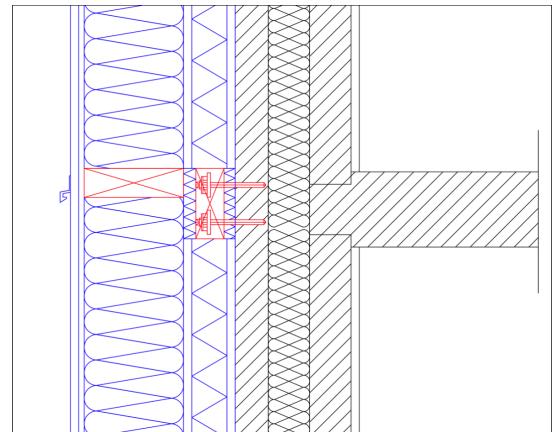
Detail drawing of attachment at the floor slab were the prefabricated facade is attached onto the existing building facade.
